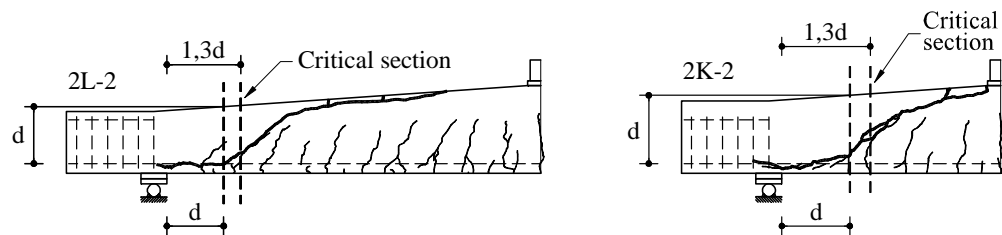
Assumed critical section and cracks of test beams 2L-2 and 2K-2
